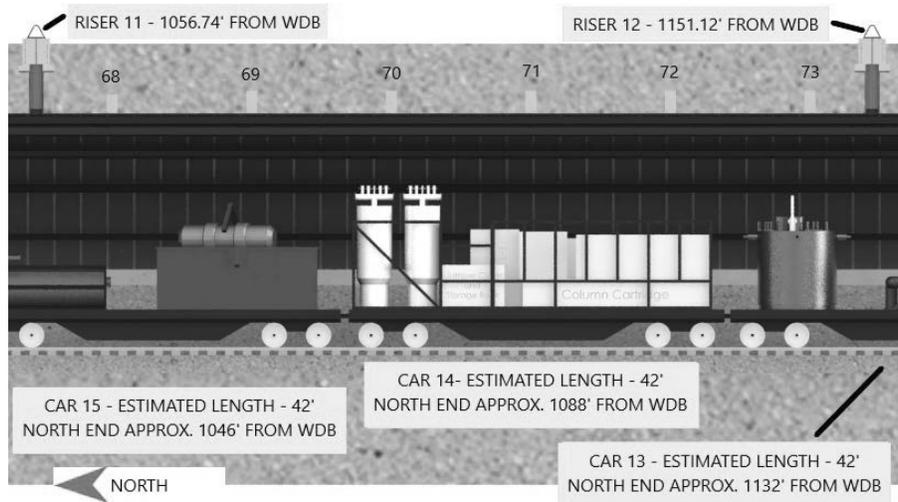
Riser 11 to Riser 12 Tunnel Section.
